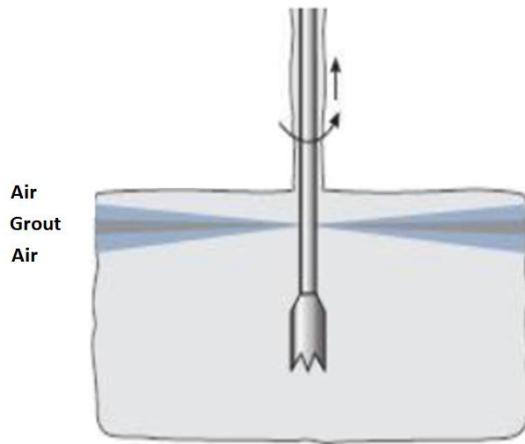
Super jet grout technique (Küsin, C.C.2009).
